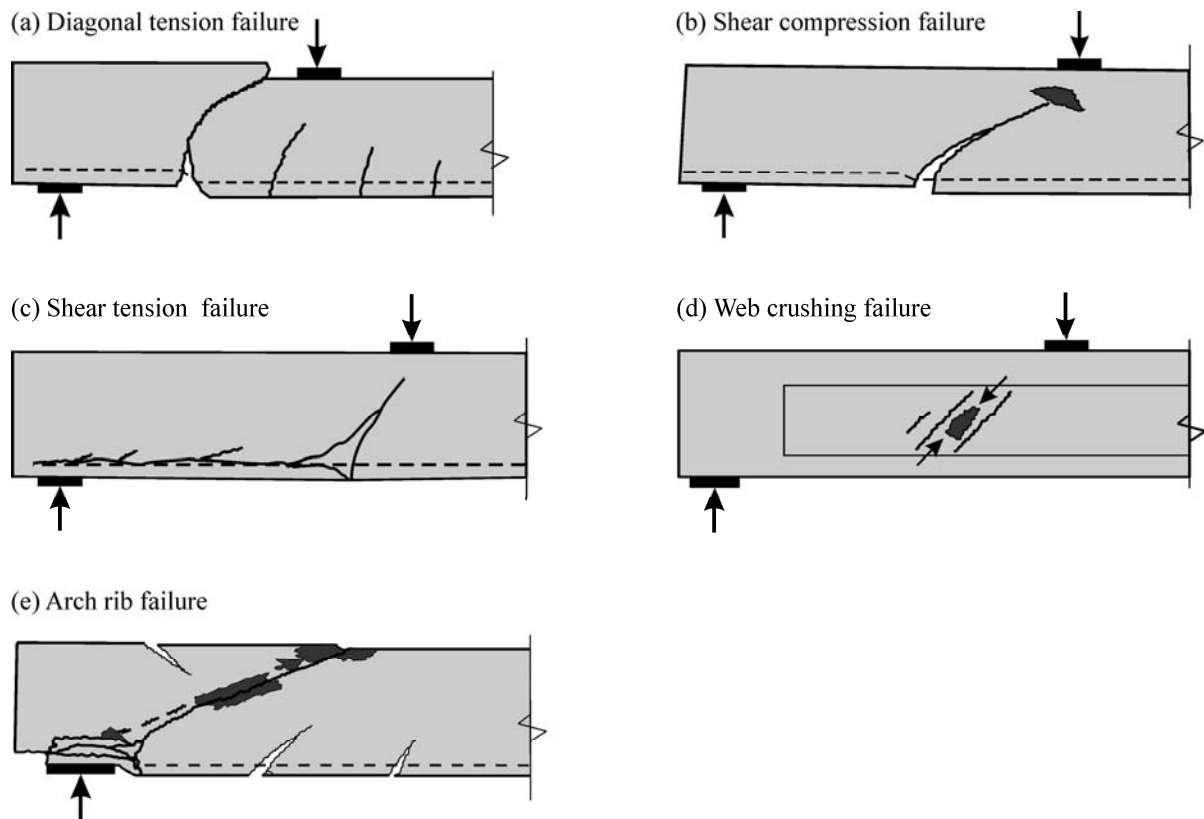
Modes of shear failure of concrete beams [Pillai et al. (2003)].
